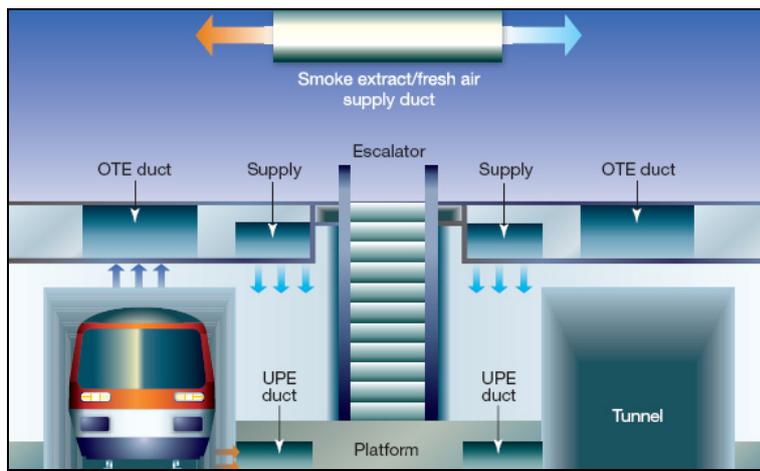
Layout of modern subway ventilation system. Source: Arup (London).
